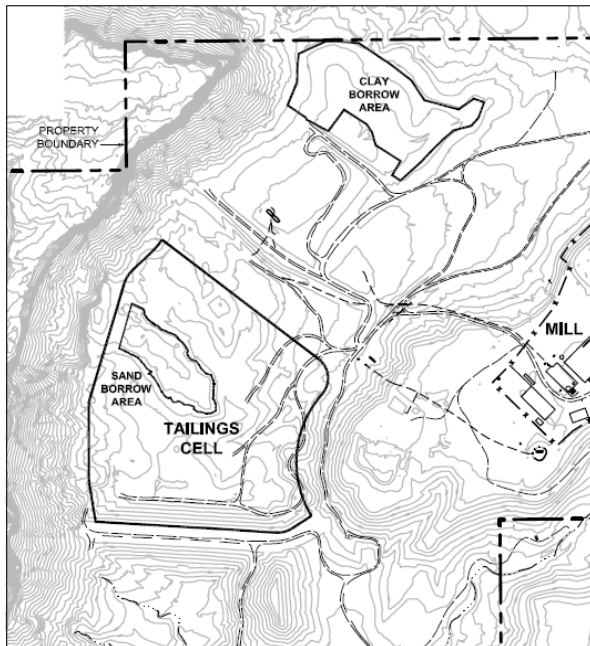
Plan view of proposed tailings cell and on-site borrow areas.
